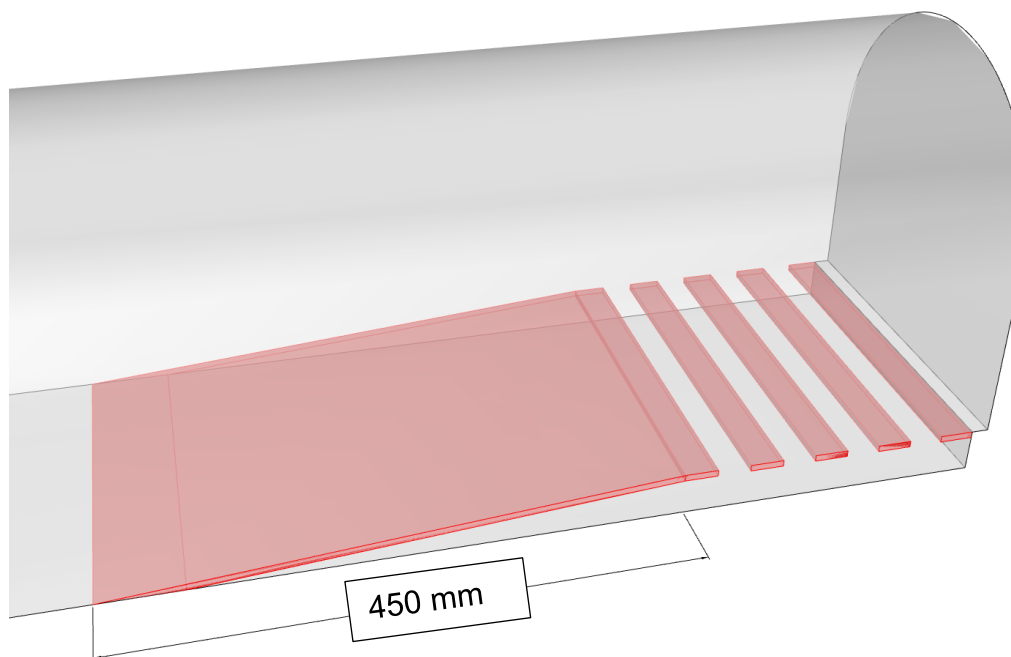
Test proposal for ribs design with ramp and sluicing pipes, 3D geometry, model scale
